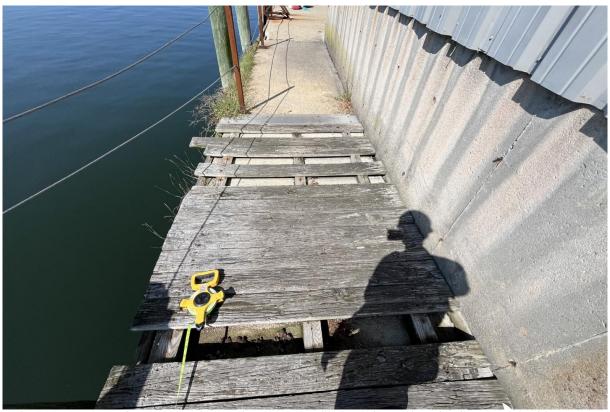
View of existing timber and concrete walkway to be replaced, adjacent to building.
